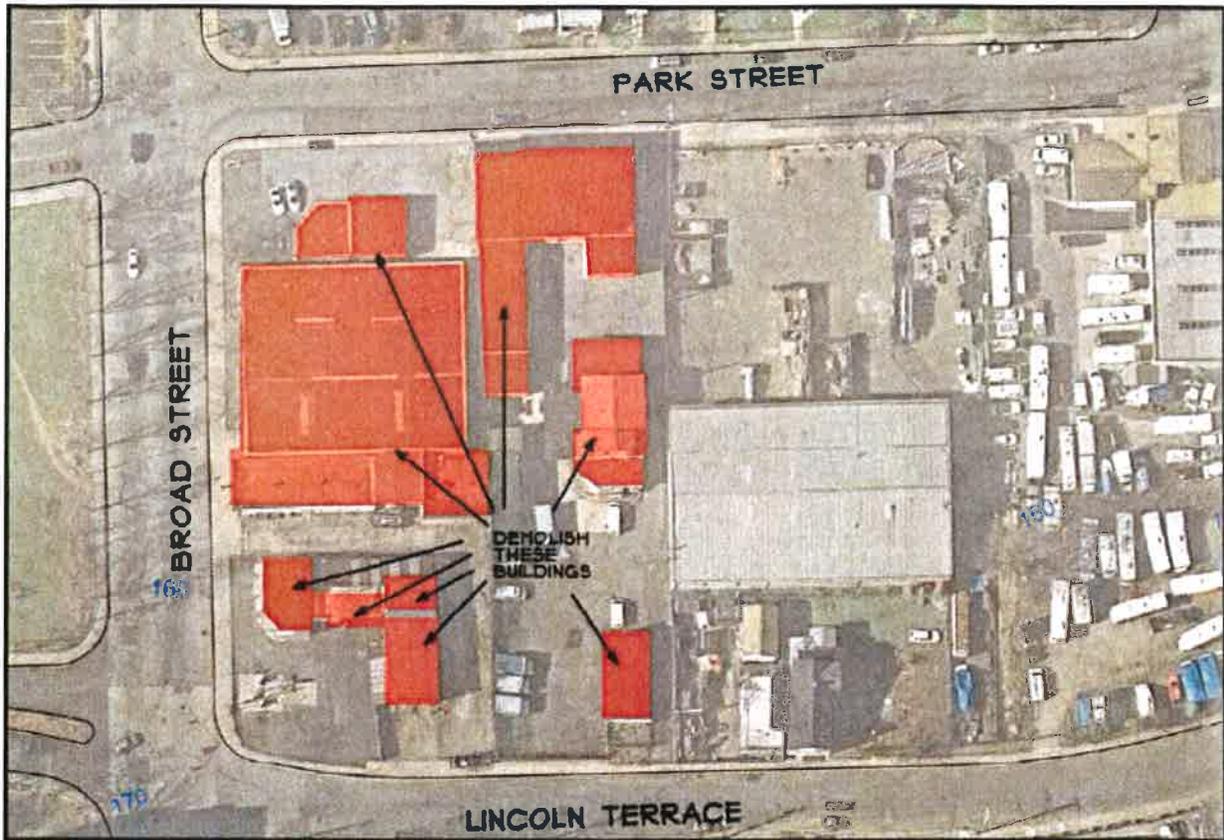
Acquisition and Demolition, Lincoln Terrace Site
